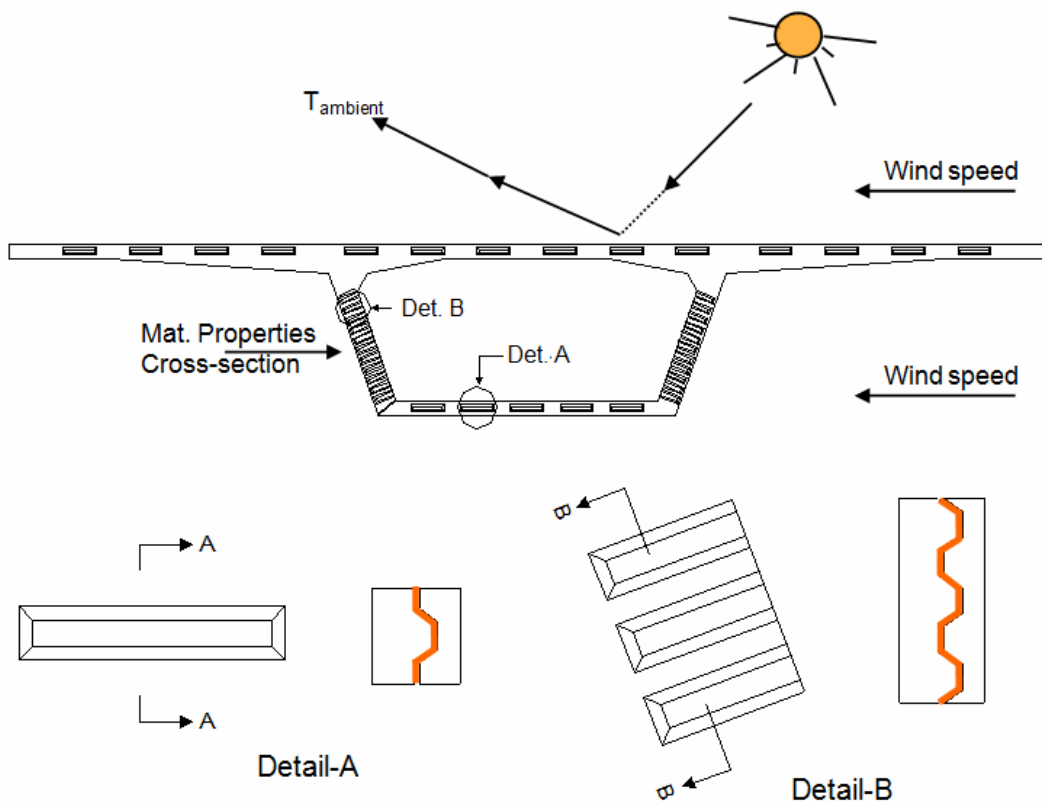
Schematic drawing of cross section of segmental precast-prestressed bridge with shear keys
